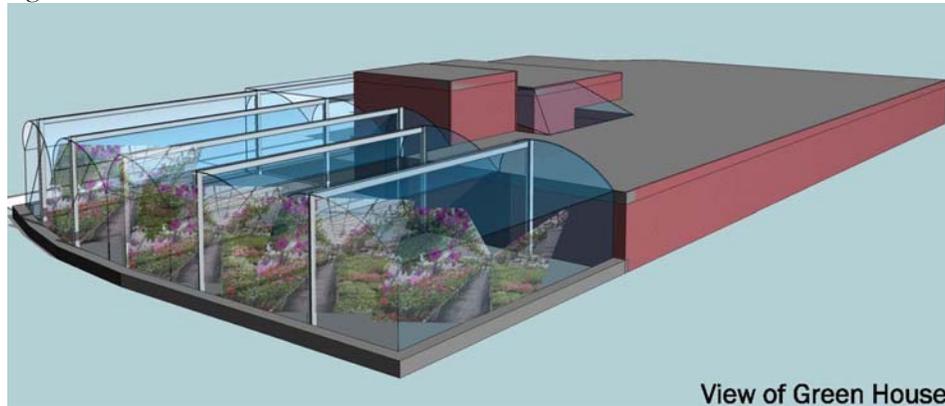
View of The Plant's roof from the northwest, showing the greenhouse and structure.
